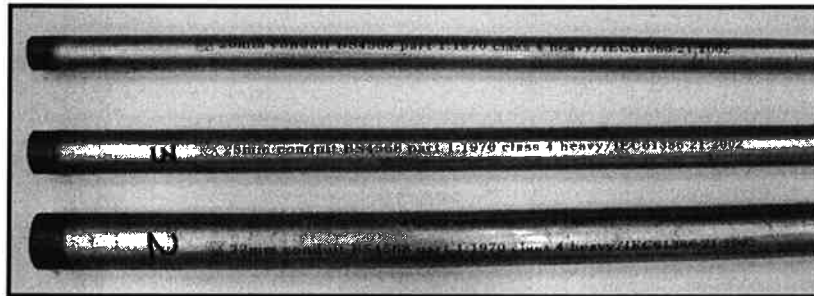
Steel conduit pipe Ø20mm, Ø25mm, and Ø32mm
